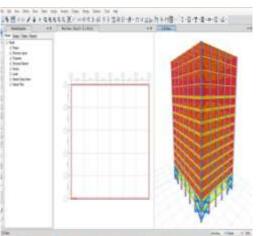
Plan and 3D view of Model 4(Bare Frame)
